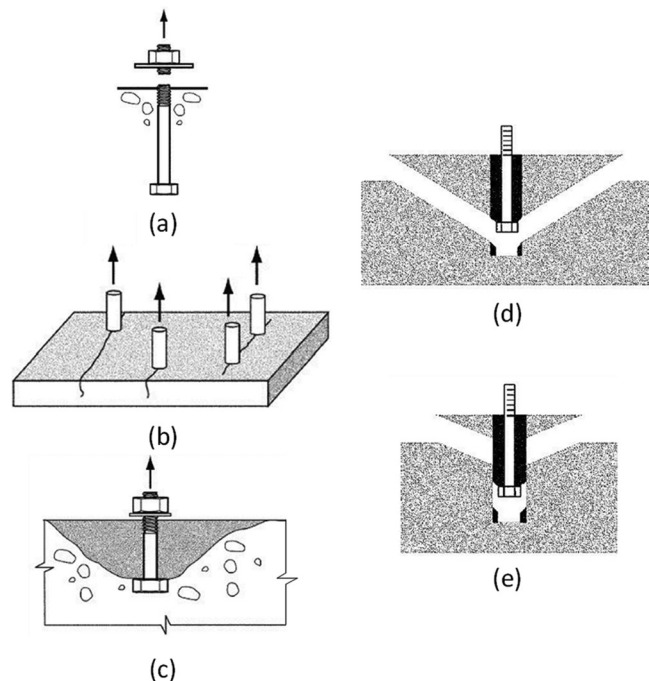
Potential failure modes for post-installed anchors: (a) yield or fracture of anchor; (b) concrete splitting between anchor locations; (c) concrete breakout cone formation (undercut anchors); (d) concrete breakout cone formation (grouted anchors); and (e) bond failure at the grout/concrete interface.<sup>10</sup>
